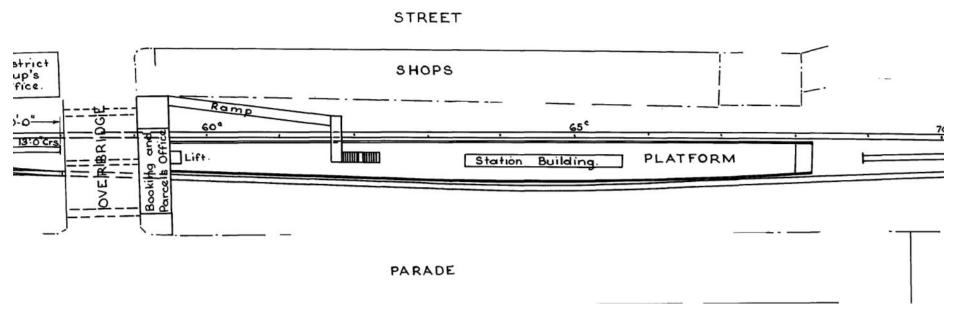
Lithgow Station in 1953 – footwarmer's shed not marked on this plan (see Figure 11 inset). Plan orientated south¹⁴
